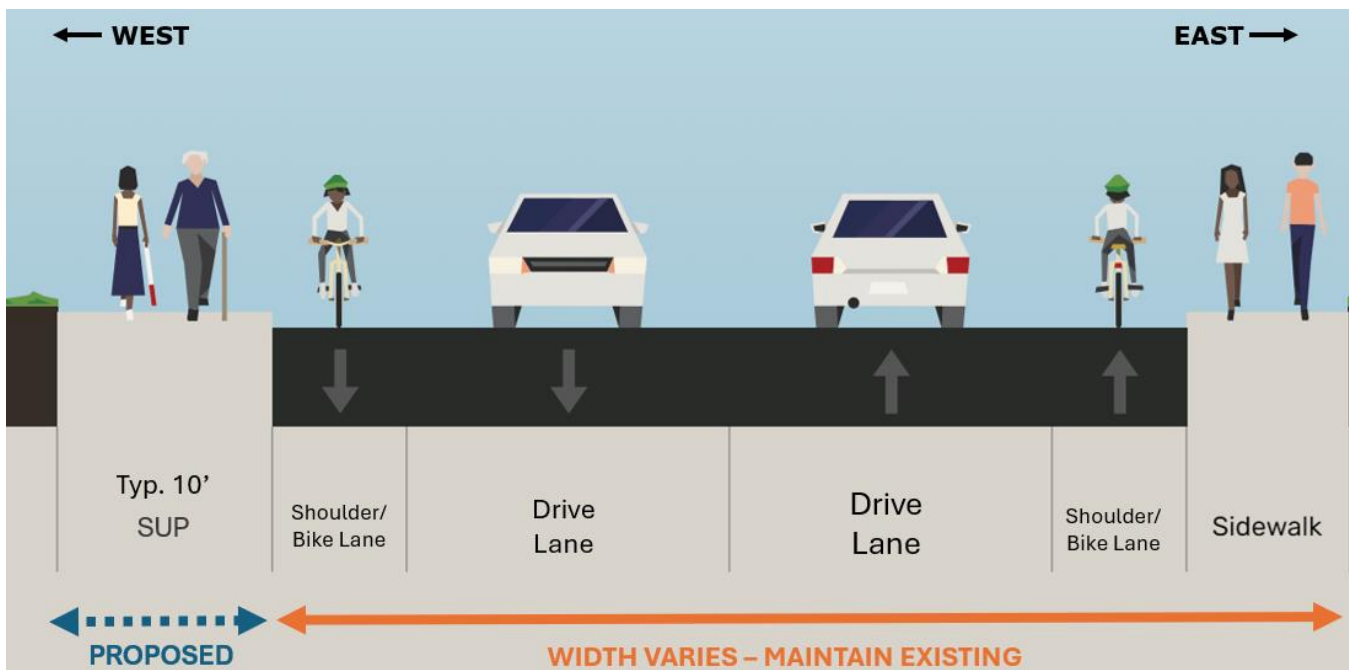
MINIMUM CROSS SECTION ELEMENTS ON SE 15TH STREET SOUTH OF REED MARKET ROAD TO ACHIEVE BLTS/PLTS 2 VIA A SHARED USE PATH
